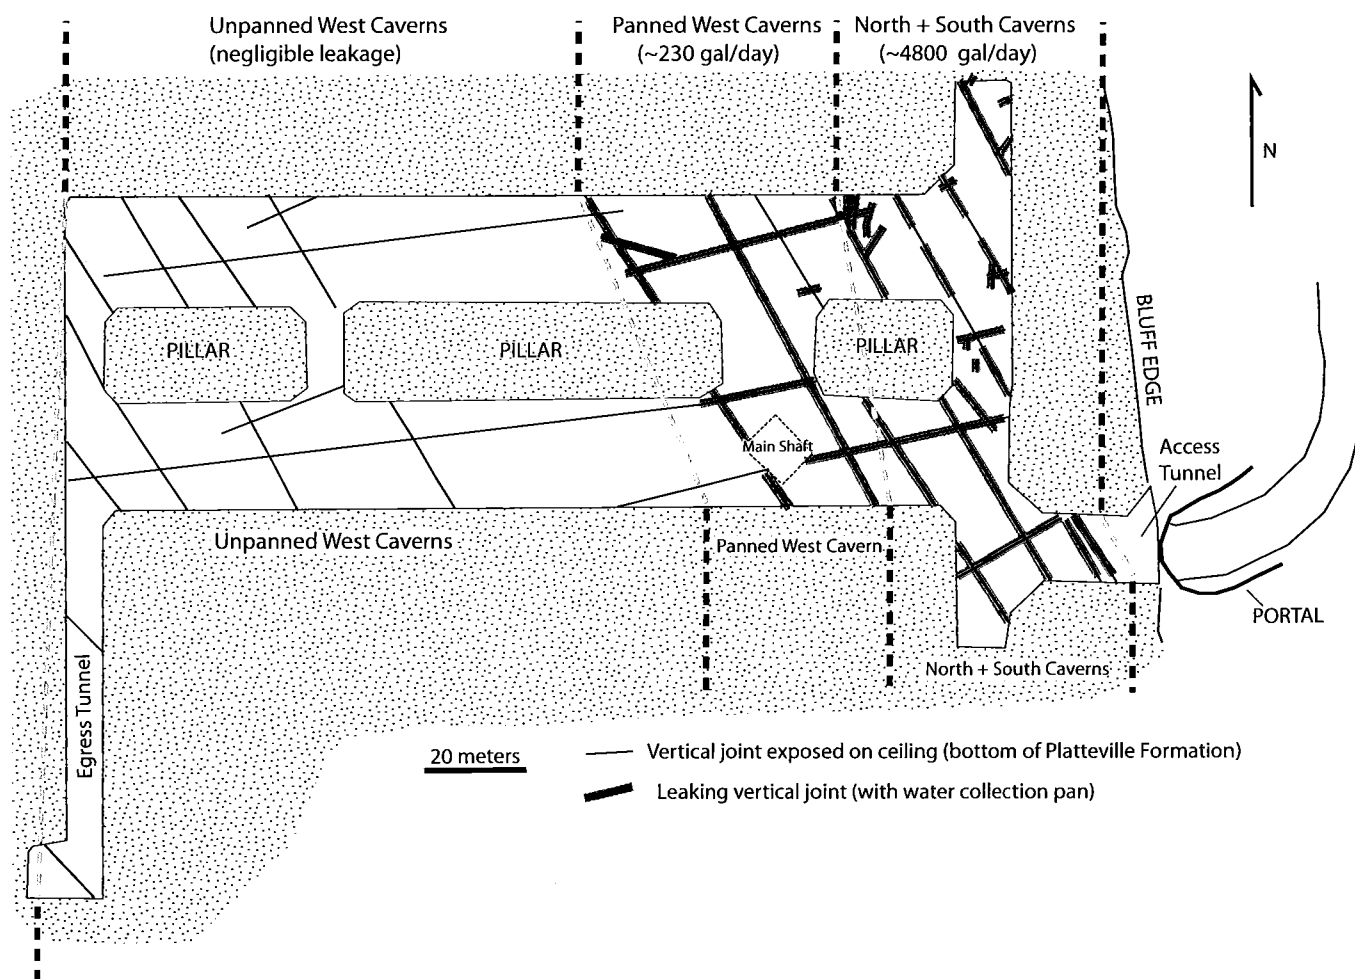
Map of excavation at the Minnesota Library Access Center underground library storage facility at the University of Minnesota, highlighting mapped vertical joints on the ceiling of the excavation, which is the bottom of the Platteville Formation. Monitoring of flow collected from pans installed beneath leaking joints provides quantification of leakage rates. The site lies beneath an ~2.1 m (7 ft) thick body of water perched on top of the Hidden Falls Member. Modified from Peer Environmental and Engineering Resources, Inc. (2001).
